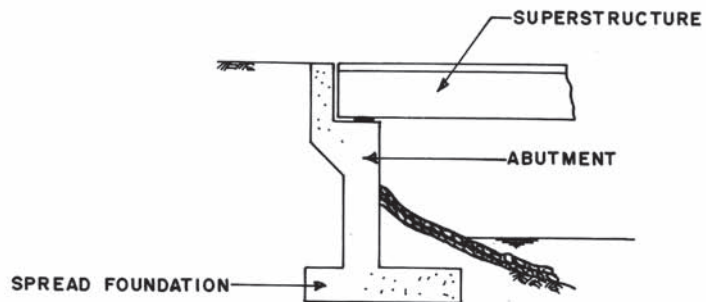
ABUTMENT ON SPREAD FOUNDATION
